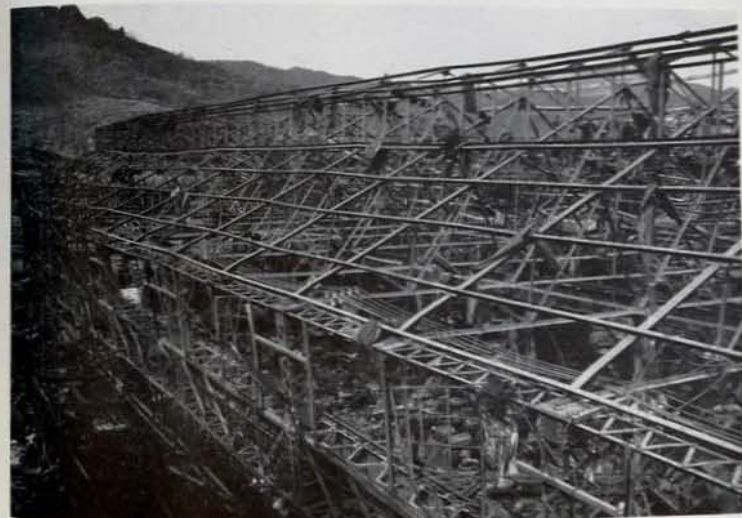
Group 26, Building 11C. Roof and south elevation.
